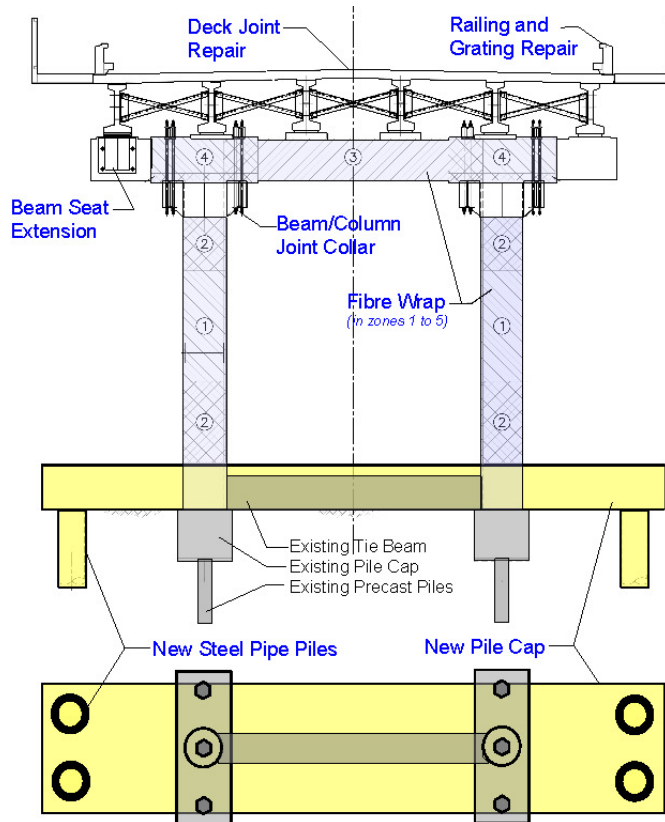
Permanent bridge retrofit including new pile caps and steel pipe piles
